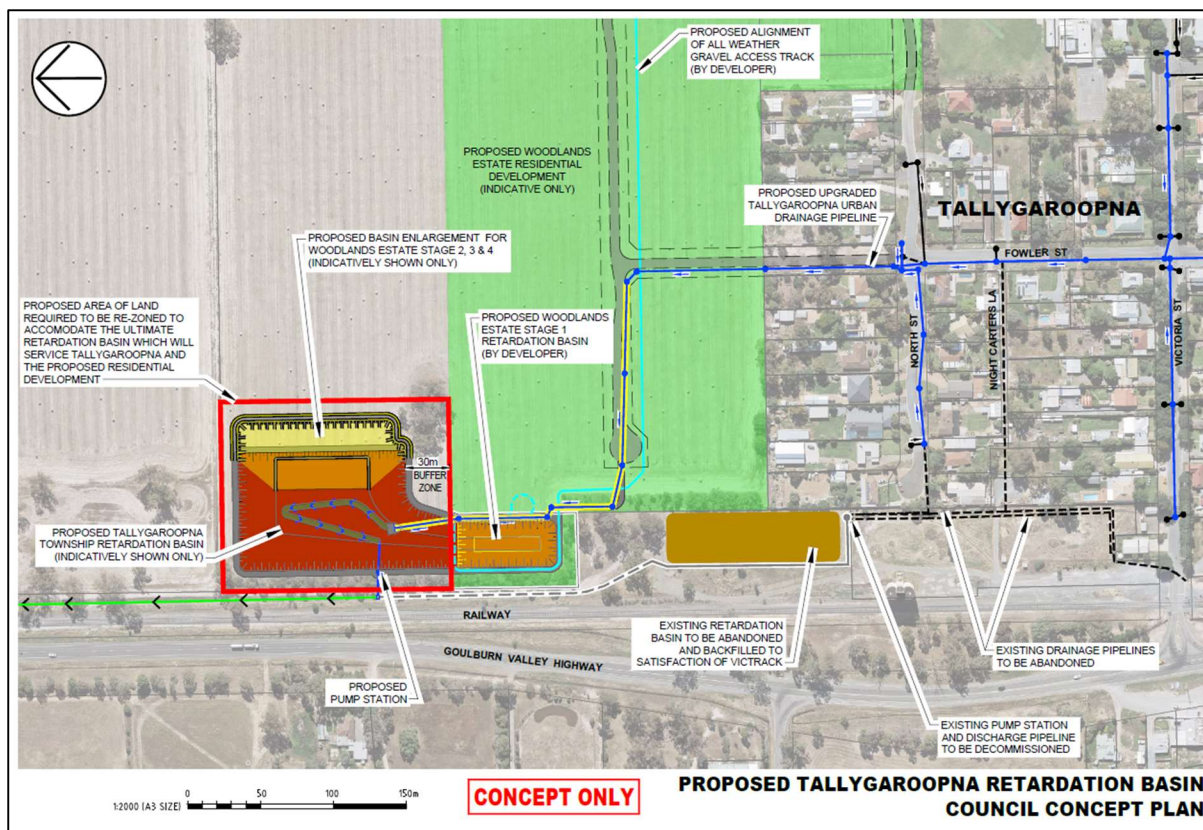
2021 Concept Plan for Township Stormwater Upgrades
